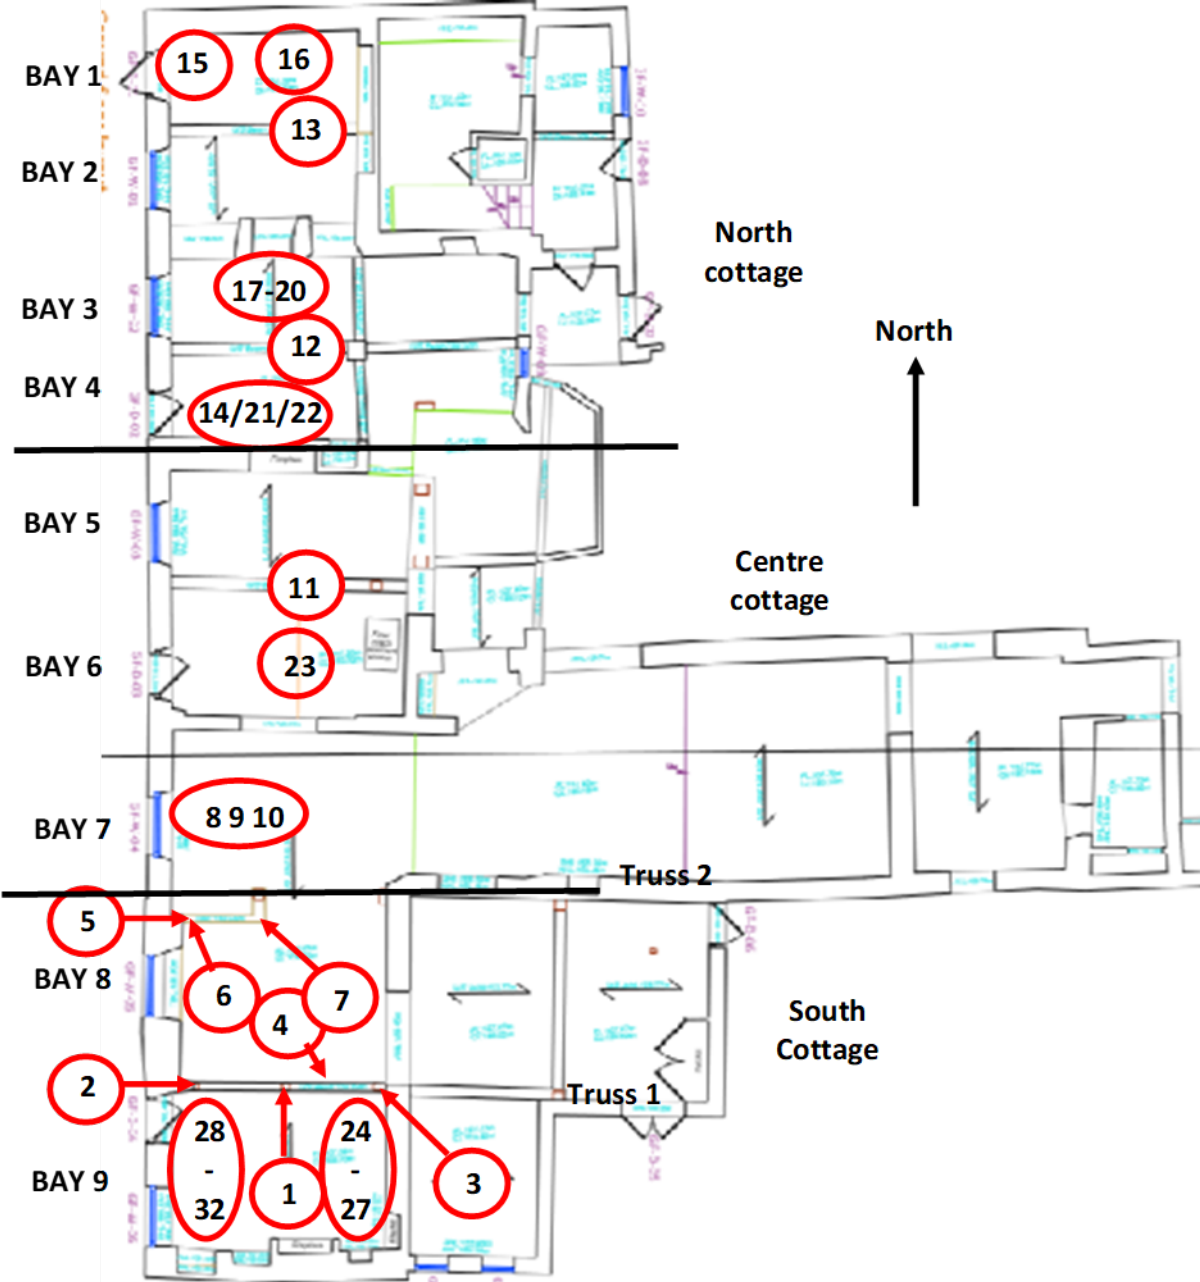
Plan of the ground floor to help locate sampled timbers. [after 2K Design Ltd.]
